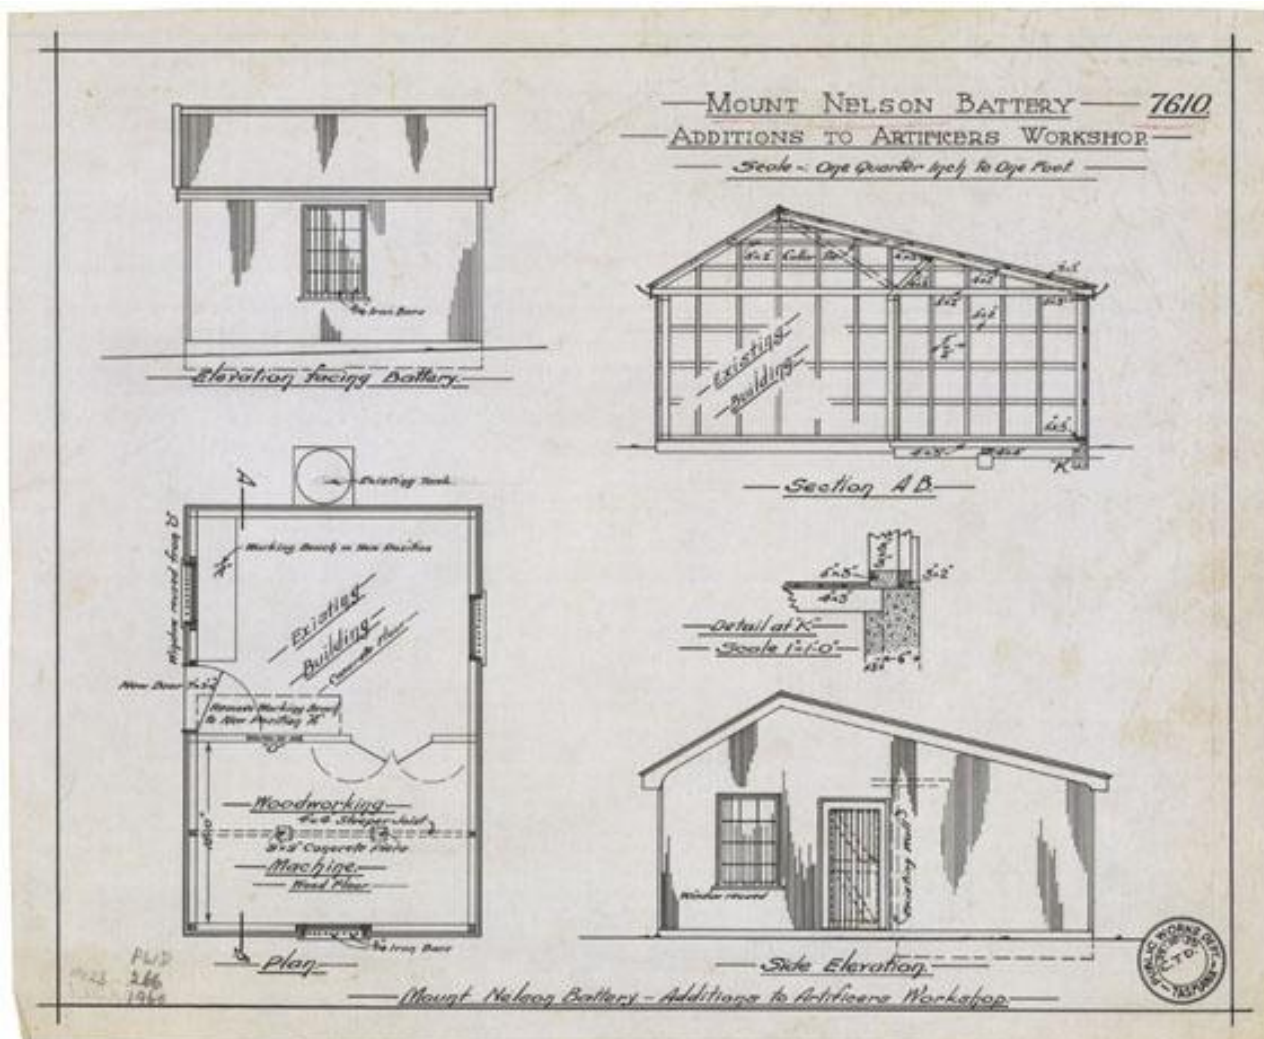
(1925) Architectural drawing - Mount Nelson Battery, Hobart, Tasmania - ground plan, elevation and section for additions to Artificers' Workshop ((National Archives of Australia, PWD266/1960).
